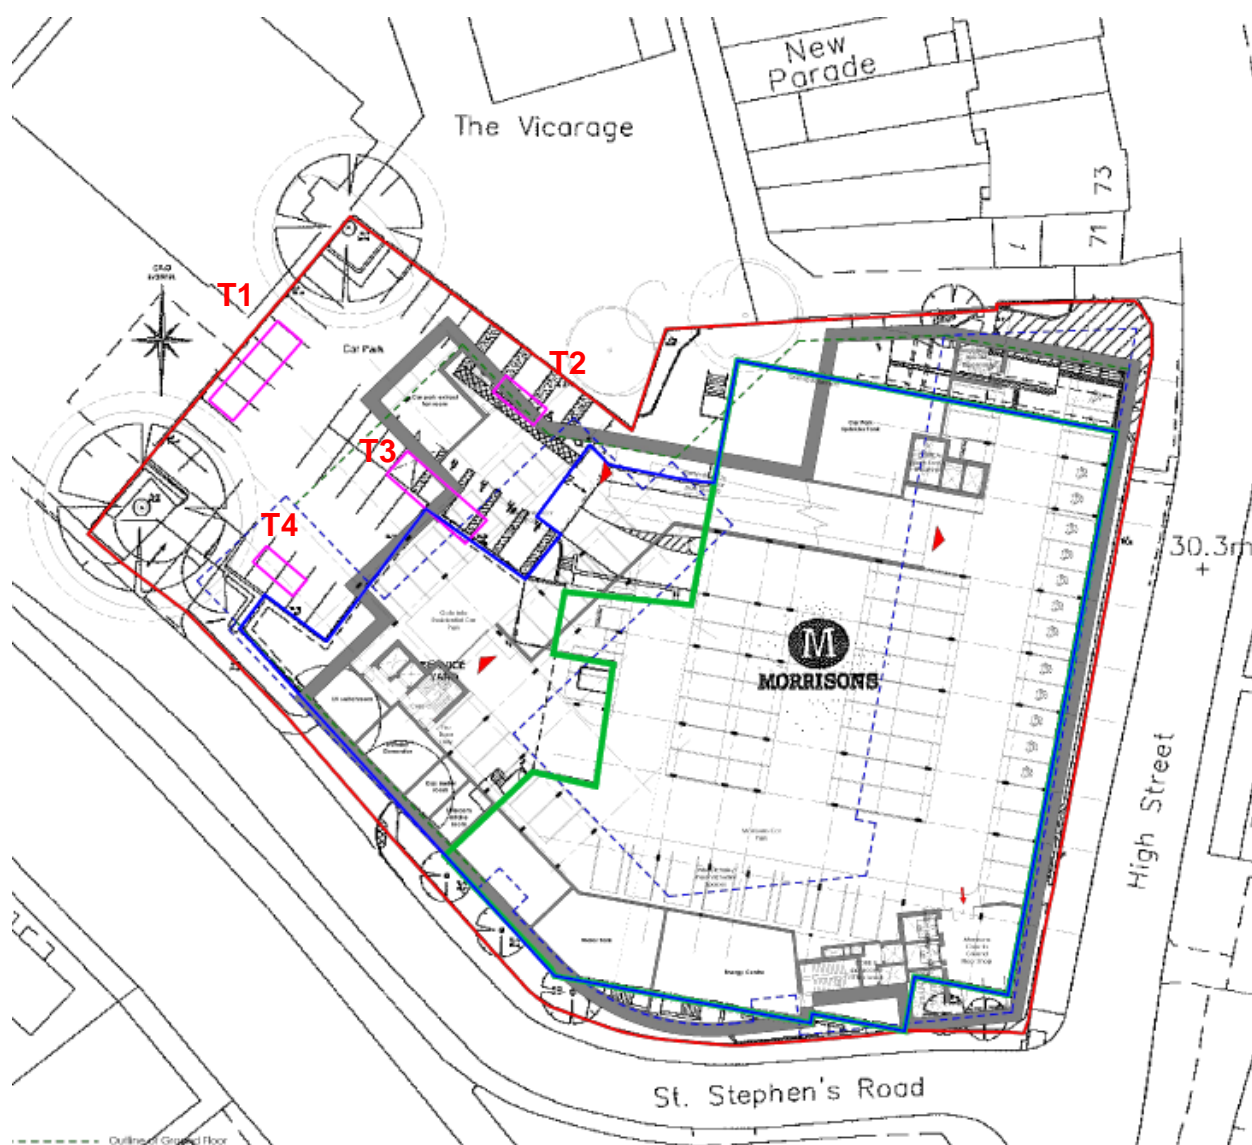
PROPOSED GROUND FLOOR PLAN
